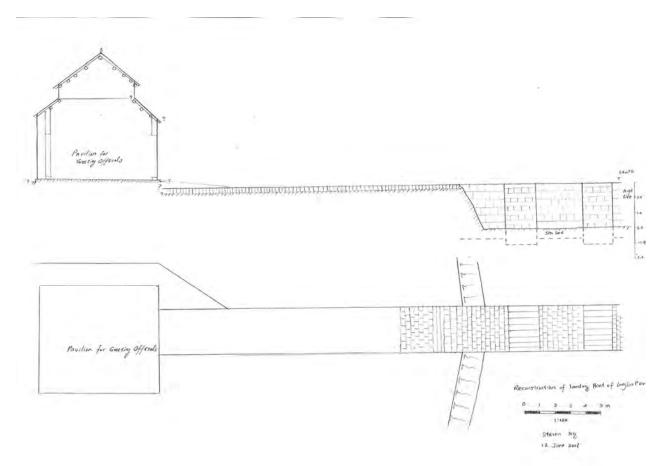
Reconstruction of Side and Top Views of Landing Portion of Longjin Bridge and Pavilion for Greeting Officials
